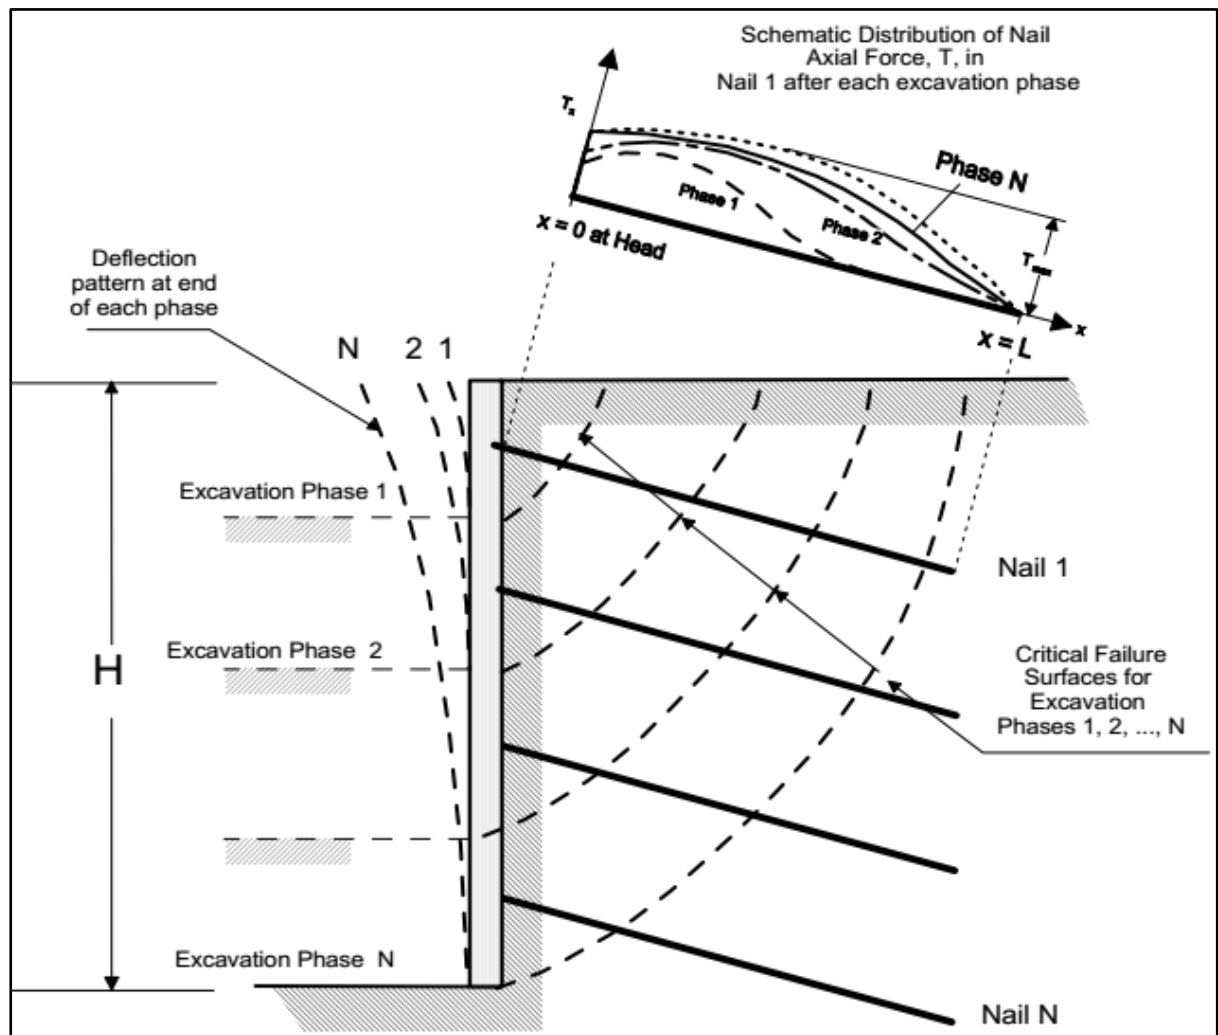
Potential Failure Surface and Load Transfer Concepts in Soil Nail Wall (Lazarte, 2003)
